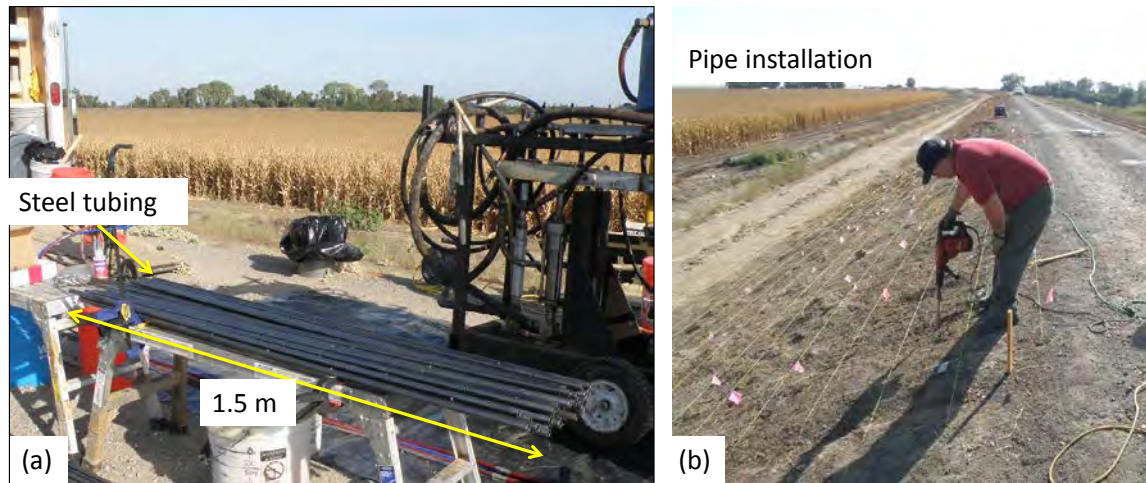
Experiment setup: (a) injection tubing prior to installation, (b) installation of tubing using jackhammer
